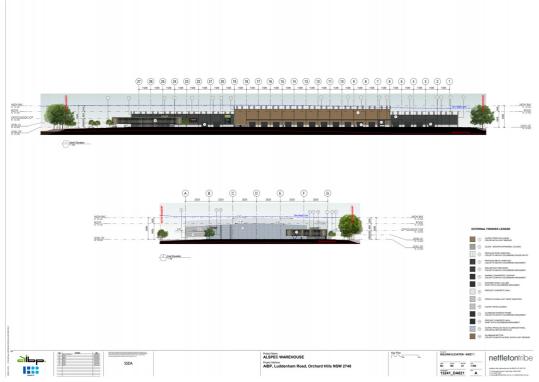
Building Elevation - Sheet 1 (Source: NettletonTribe)
